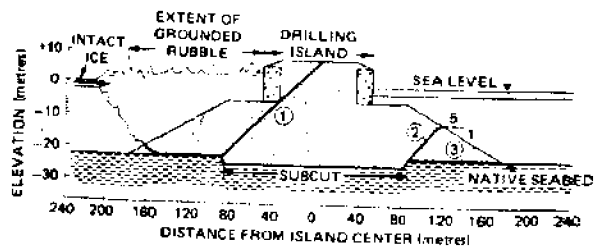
POTENTIAL FAILURE MODE UNDER HORIZONTAL ICE LOAD AT A CAISSON ISLAND
